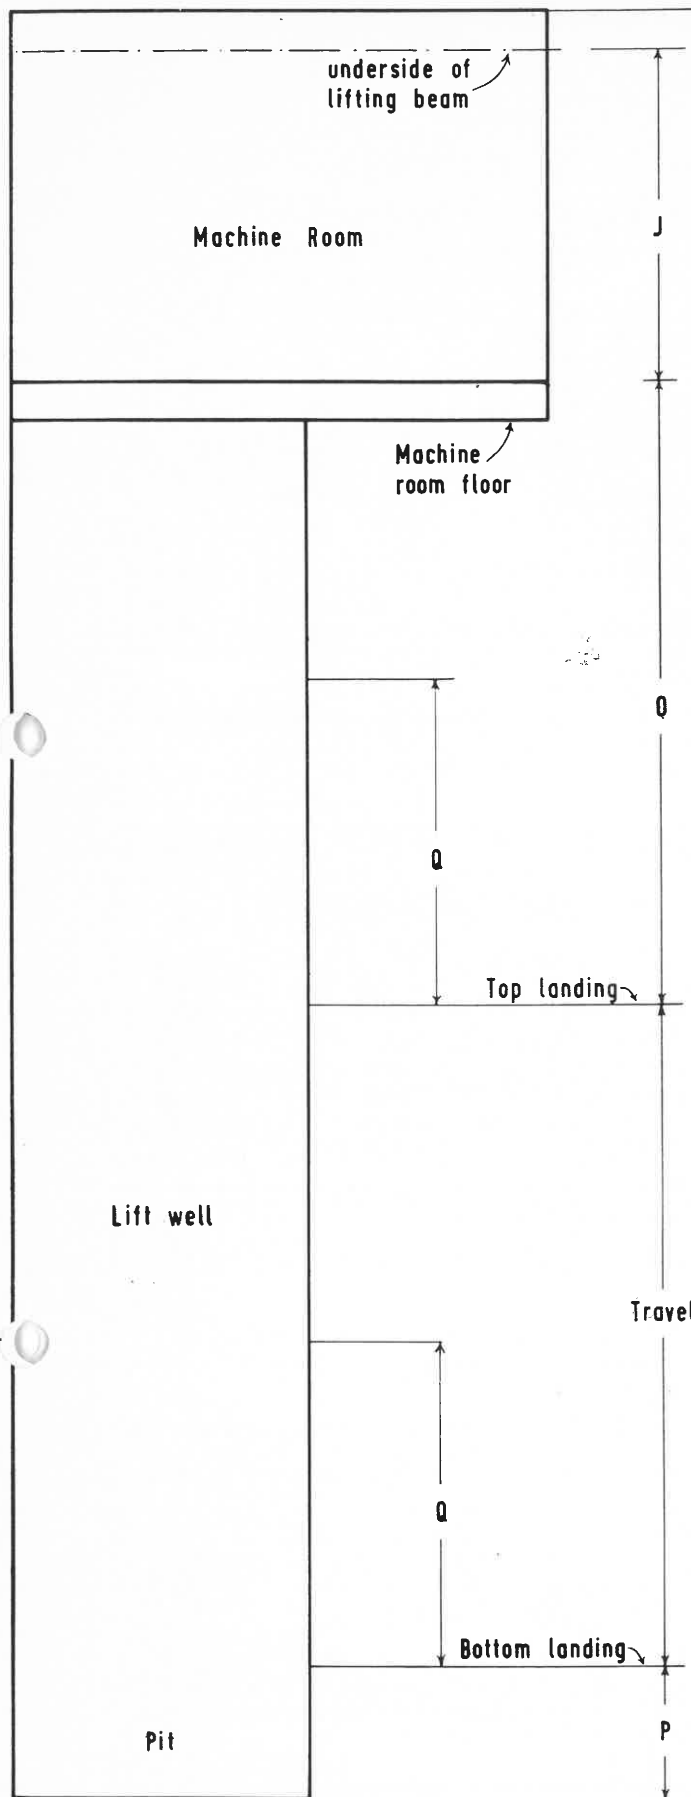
Passenger Lifts—Outline Dimensions of Pit Depth and Headroom
